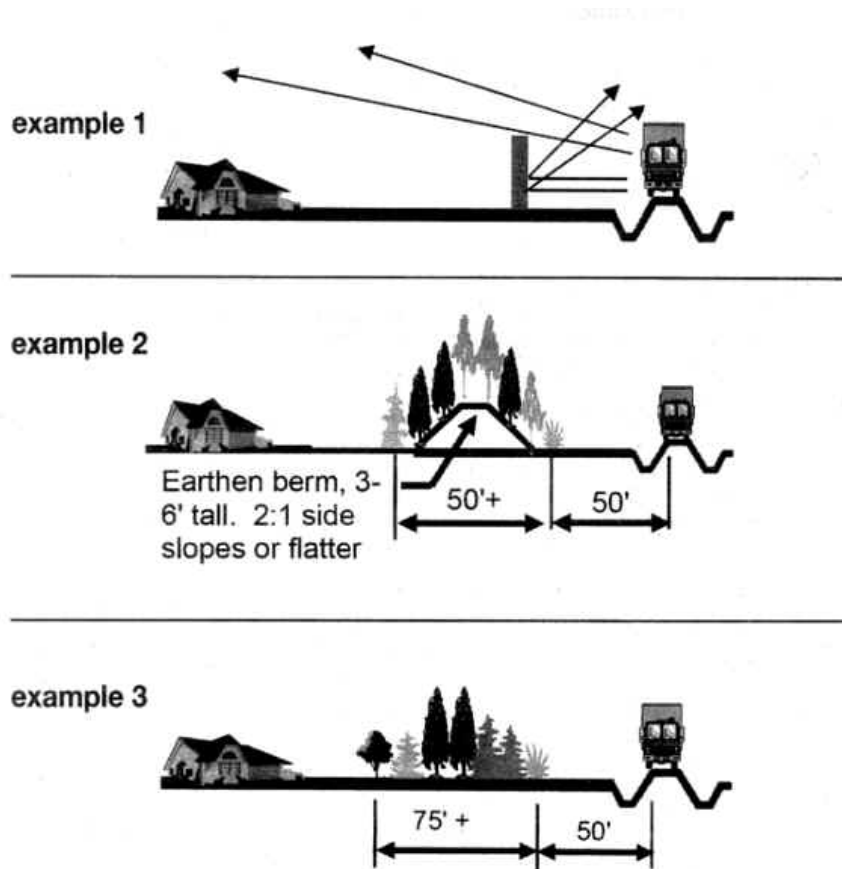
Examples of Planting Barrier (Antelope Valley Tree Farm, 2015)
